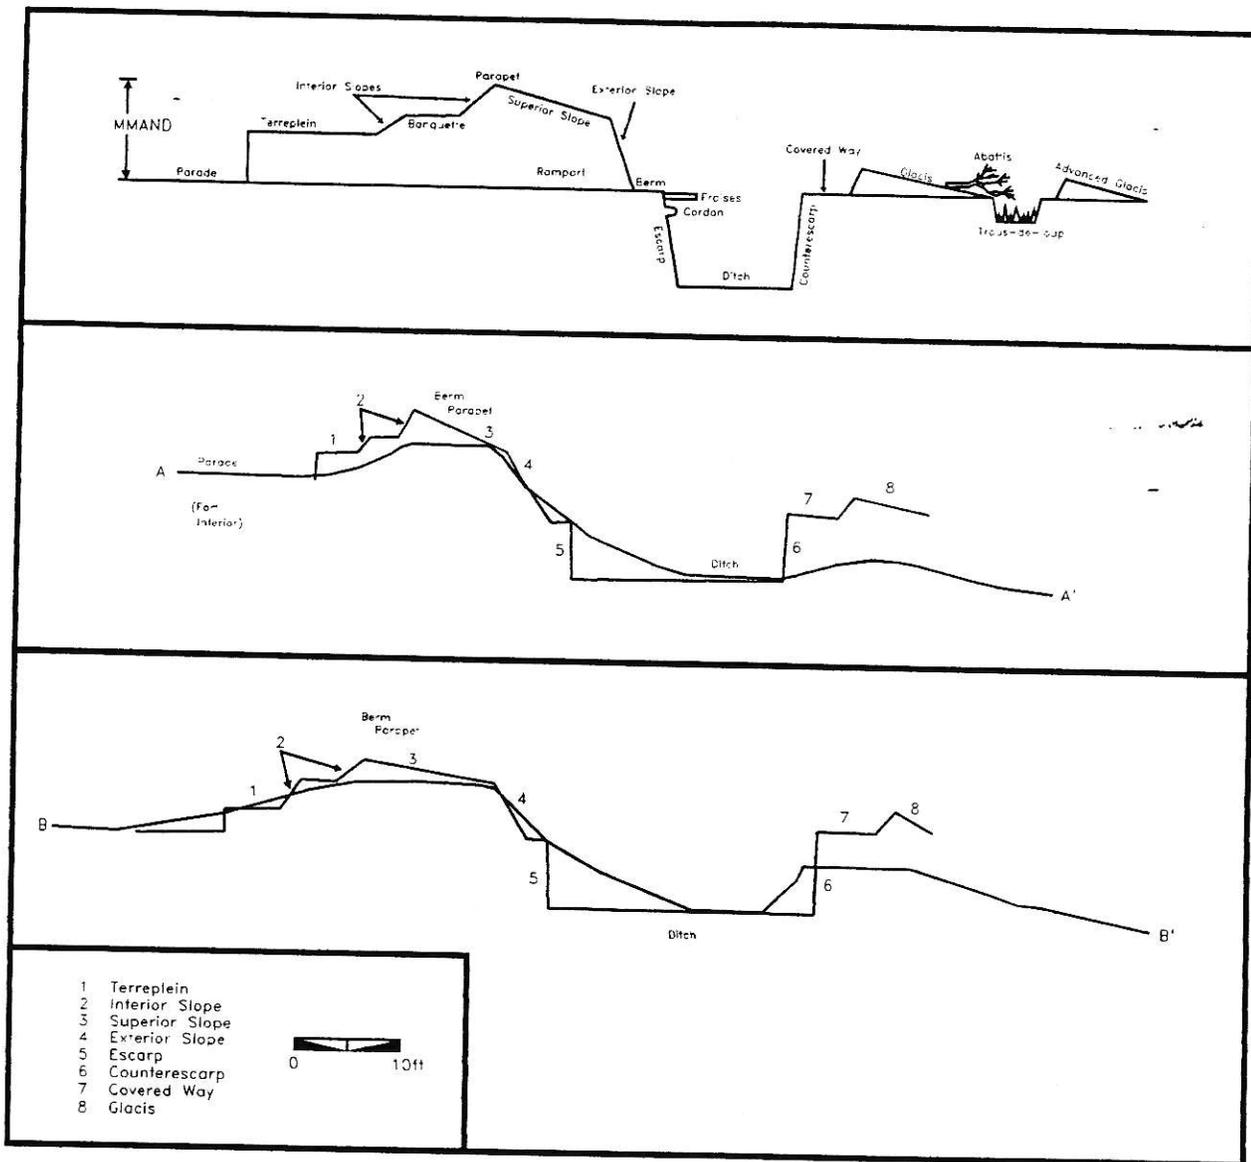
Typical elements of fortification compared to two cross-sections of the main embankment (see Figure 10 to reference these cross-section locations).
